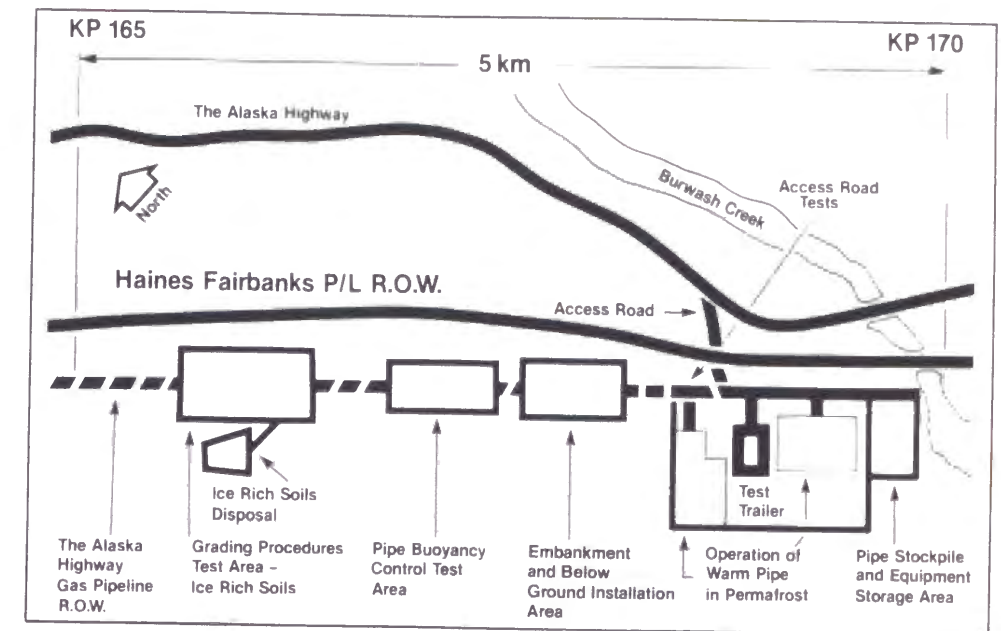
Layout of Quill Creek test site (Fielder, 1986)
